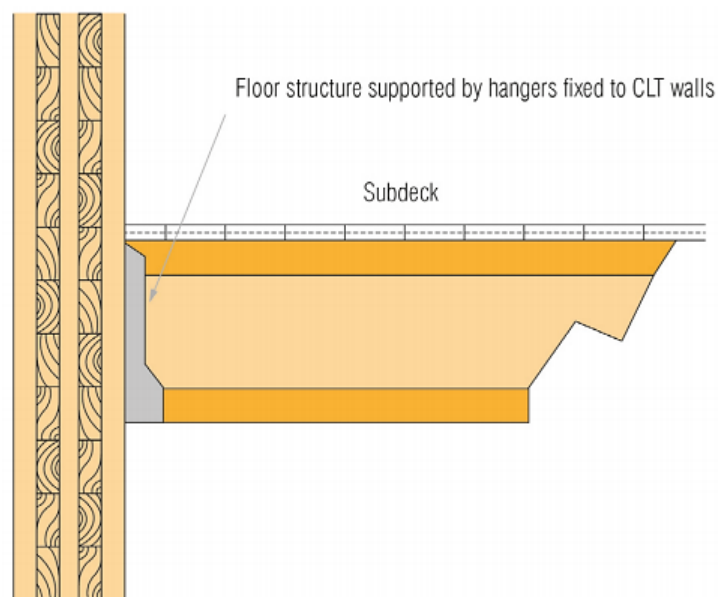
Wall-joint detail - balloon-frame method [9]
